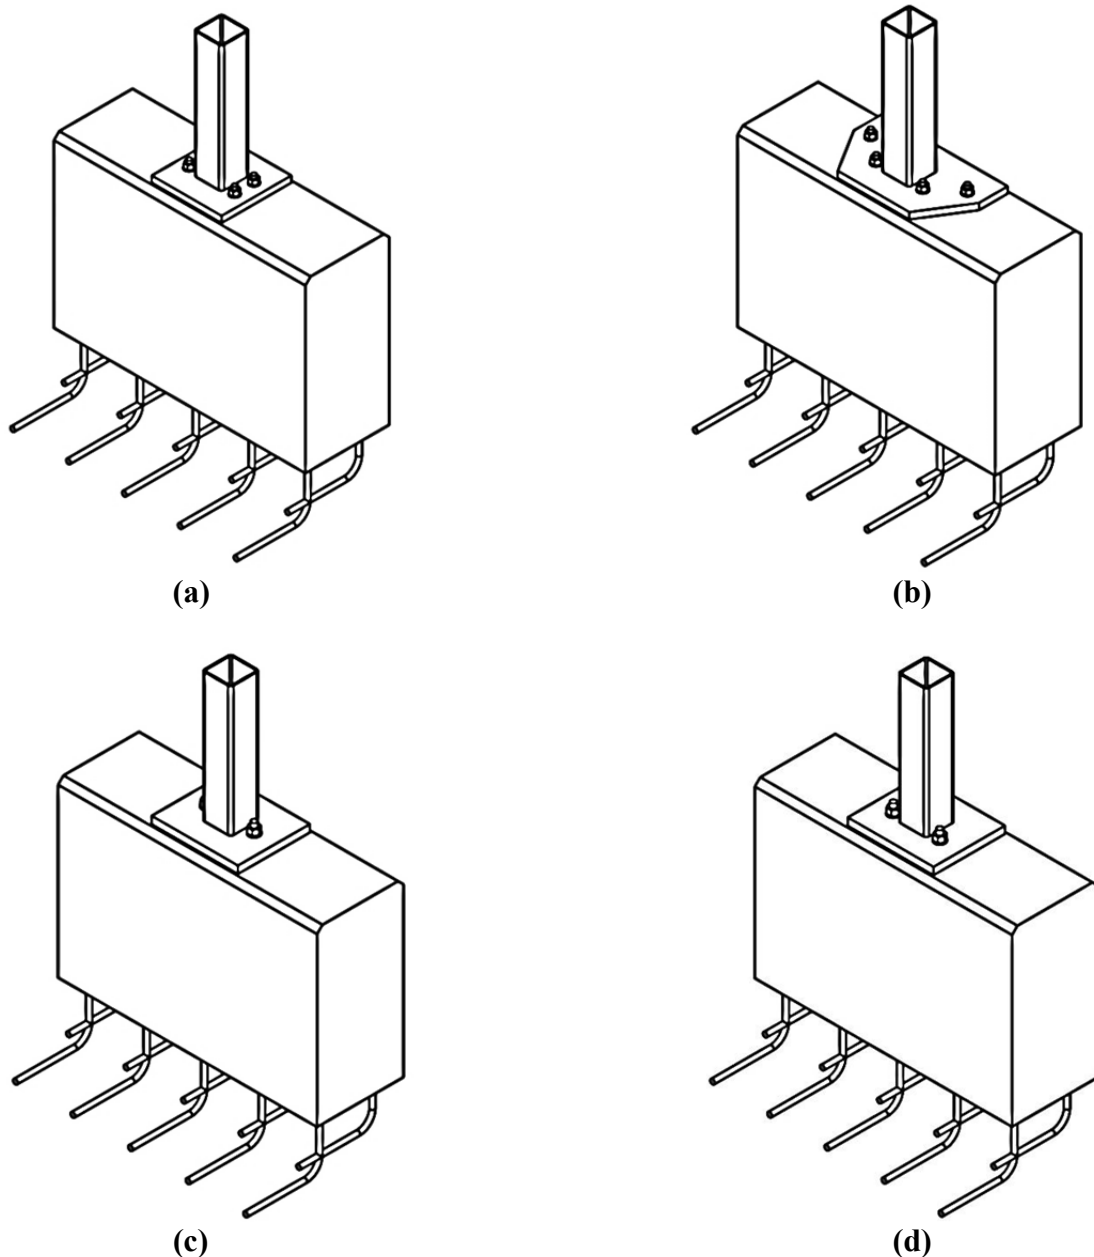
Alternative epoxy adhesive anchorage concepts: (a) square, four-anchor concept; (b) spread, four-bolt concept; (c) centered, two-anchor concept; and (d) offset, two-anchor concept.
